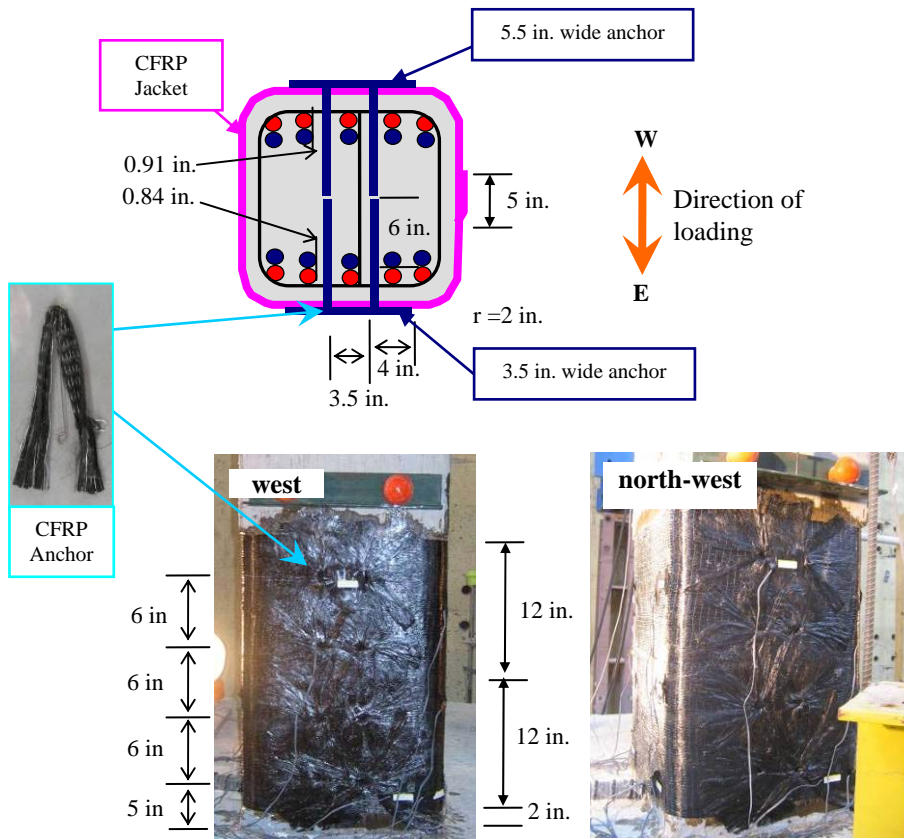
Layout of the CFRP jackets and CFRP anchors, 3-B-S10-M
